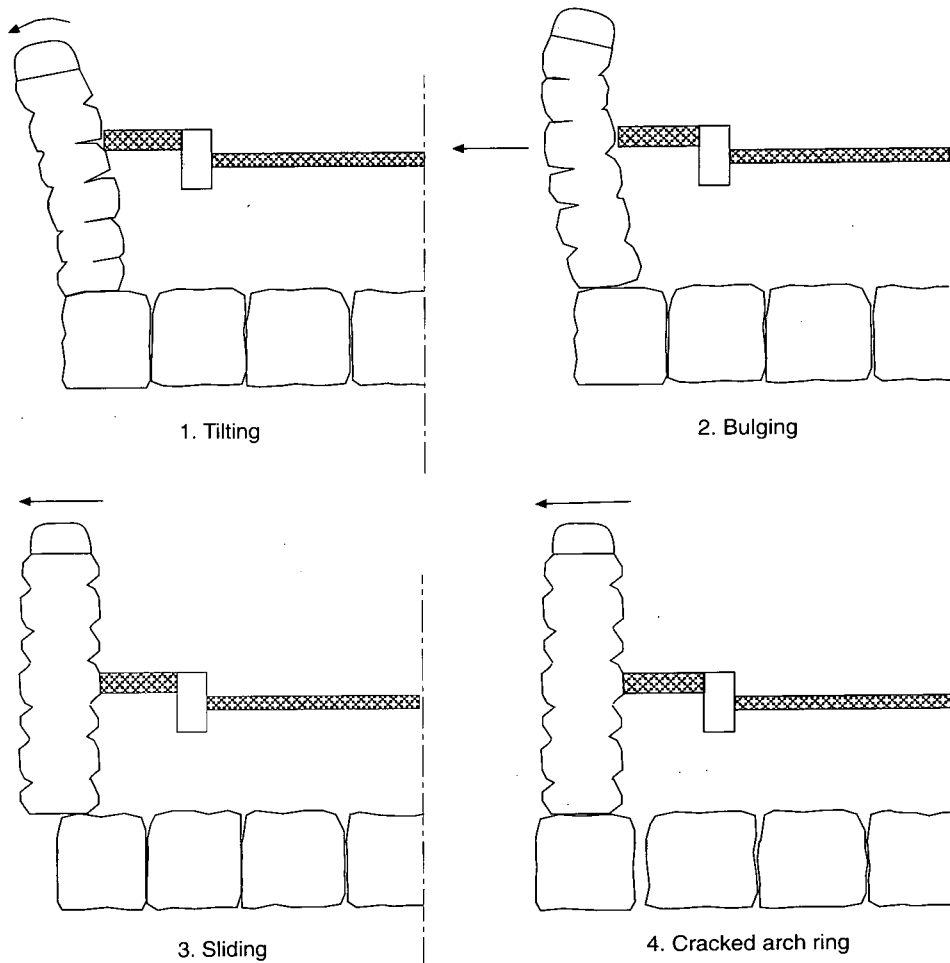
Spandrel wall failures (source: BA 16/93, Fig 5/1)
